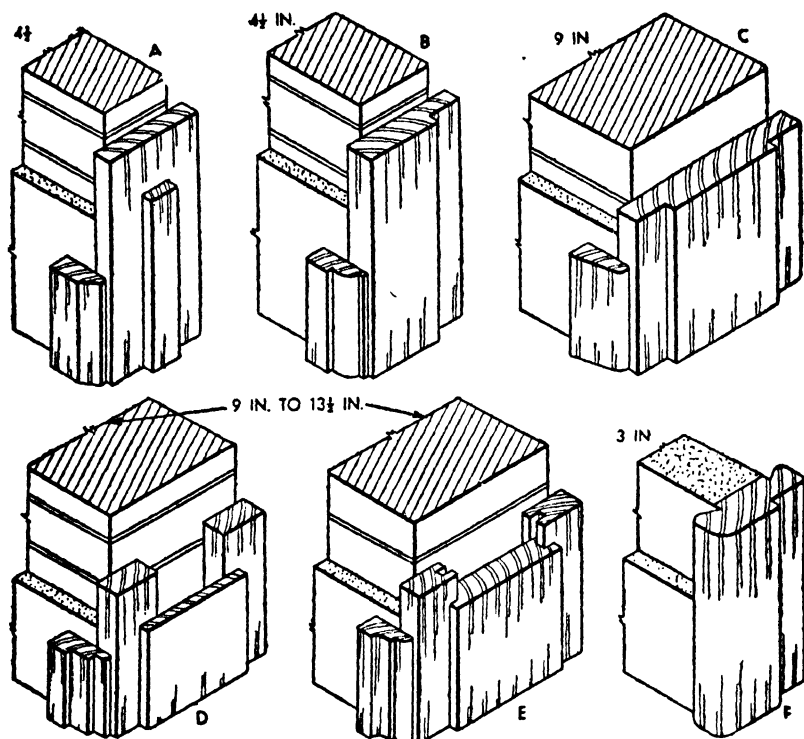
Thickness of wall decides the type of construction of jamb linings or casings. A and B. Half-brick wall with lining and planted door stop; C. 9 in. wall; D and E. built-up linings; F. solid frame with provision for plaster.
